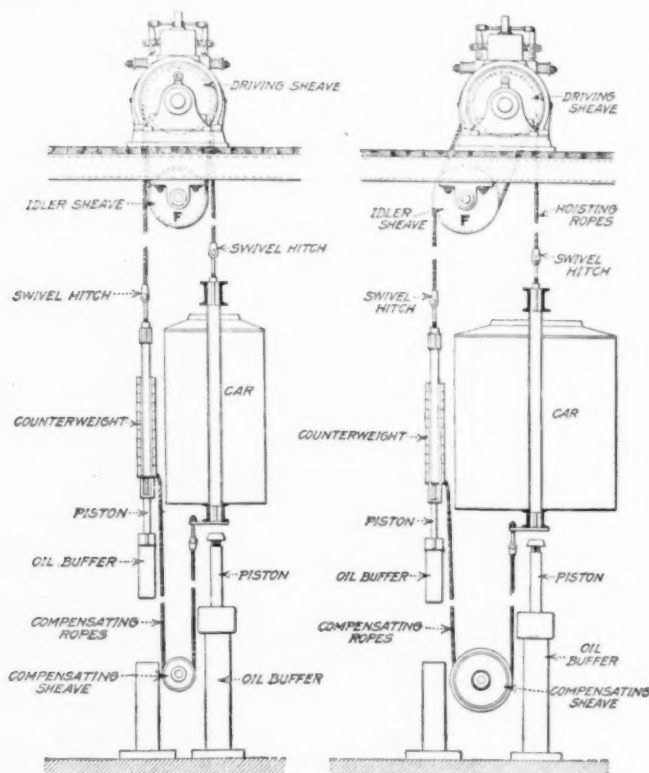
INSTALLATION WHERE DRIVING SHEAVE SPANS HALF THE CAR WIDTH
